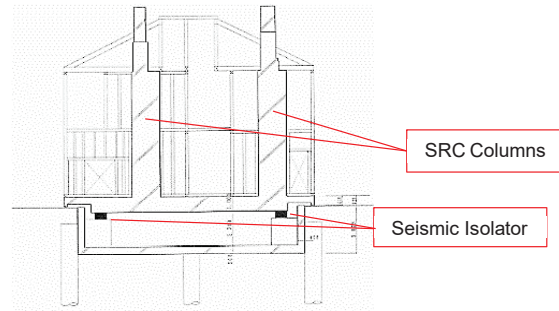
Cross-section of Reinforcements (SRC columns and seismic isolators) of the Jugobankan Building [4]
